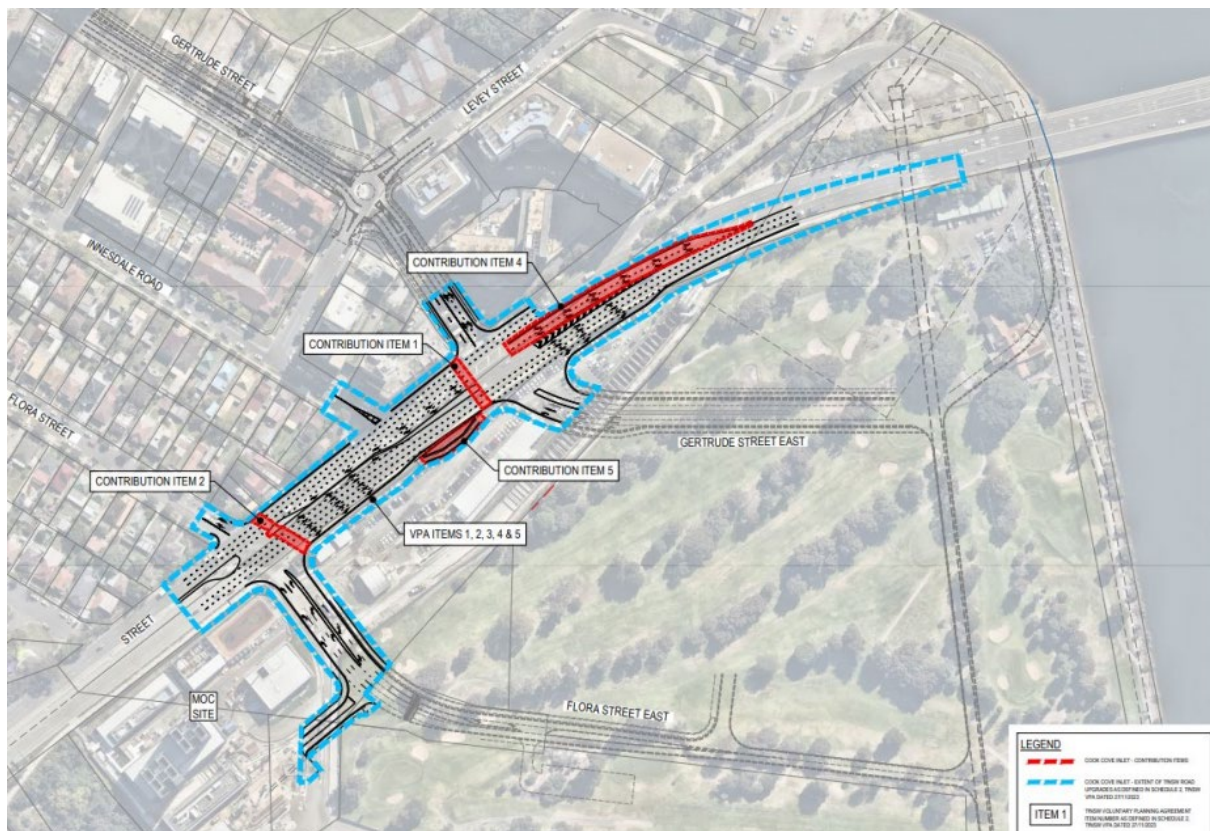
Indicative Roadworks Plan –SVPA2024-25
